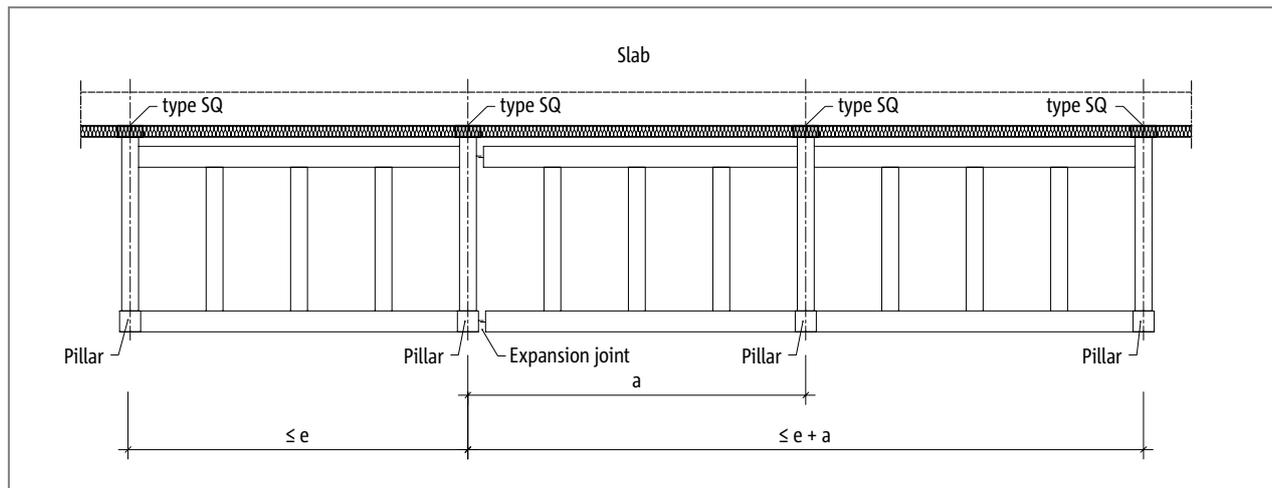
Schöck Isokorb® T type SQ: Maximum expansion joint spacing e and lateral overhang a
